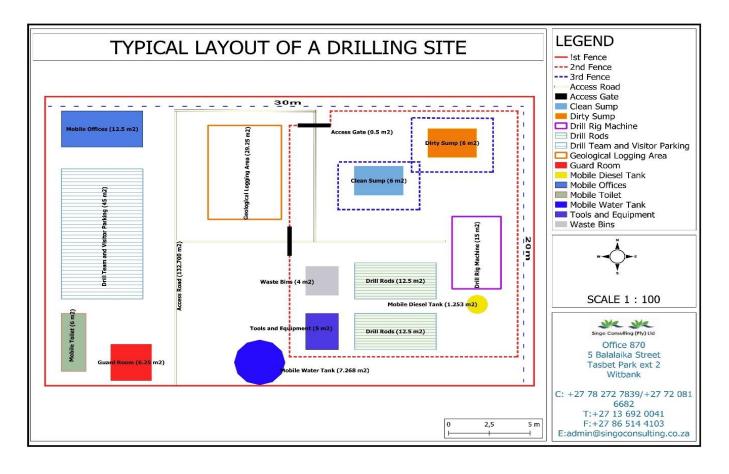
Typical layout plan of a drilling site (Singo Consulting, 2022)
